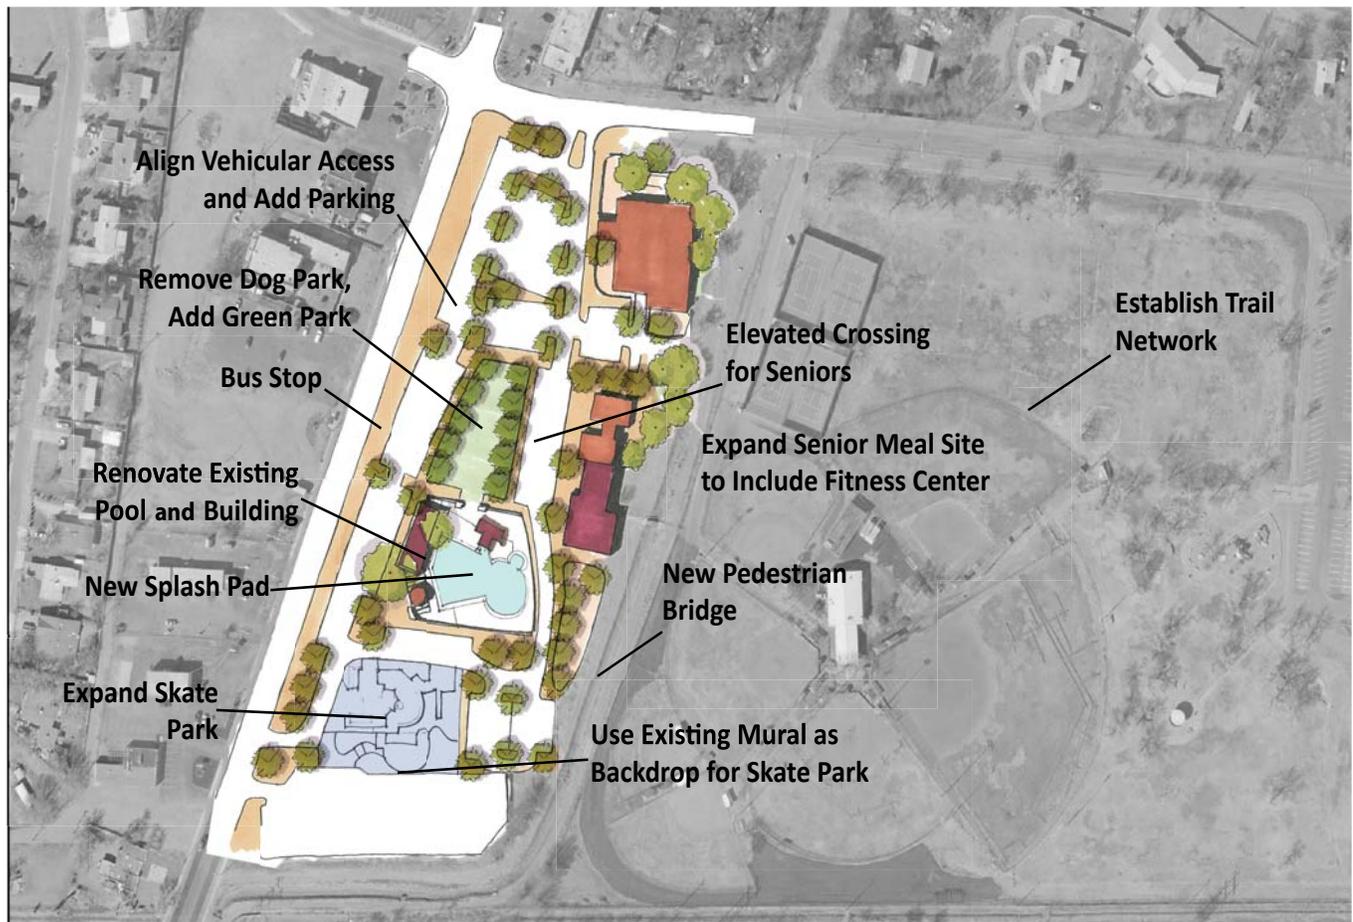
4: Conceptual Plan for Rio Bravo Facilities
